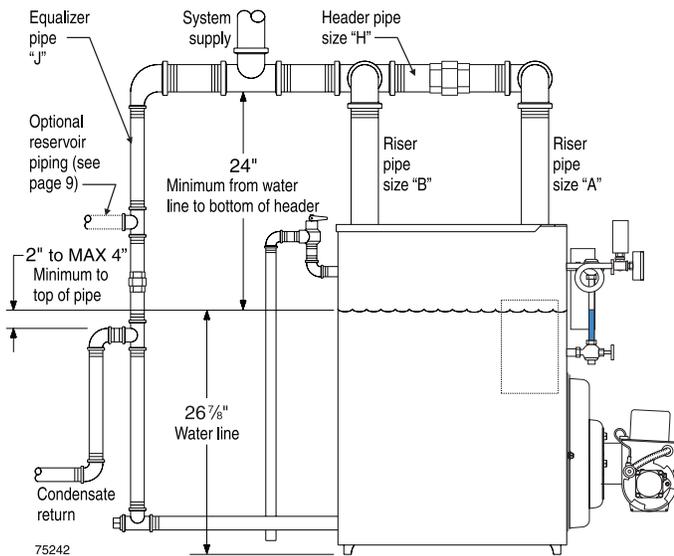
Recommended piping, OSB-3, -4 and -5, piping for parallel-flow systems only
